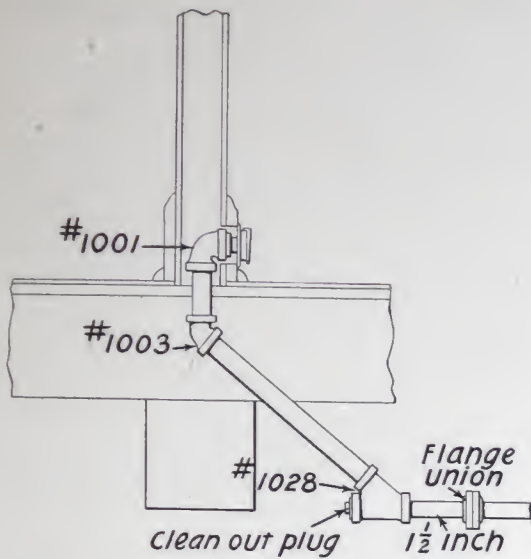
Typical connection to inlet coupling, located in baseboard of first story.
